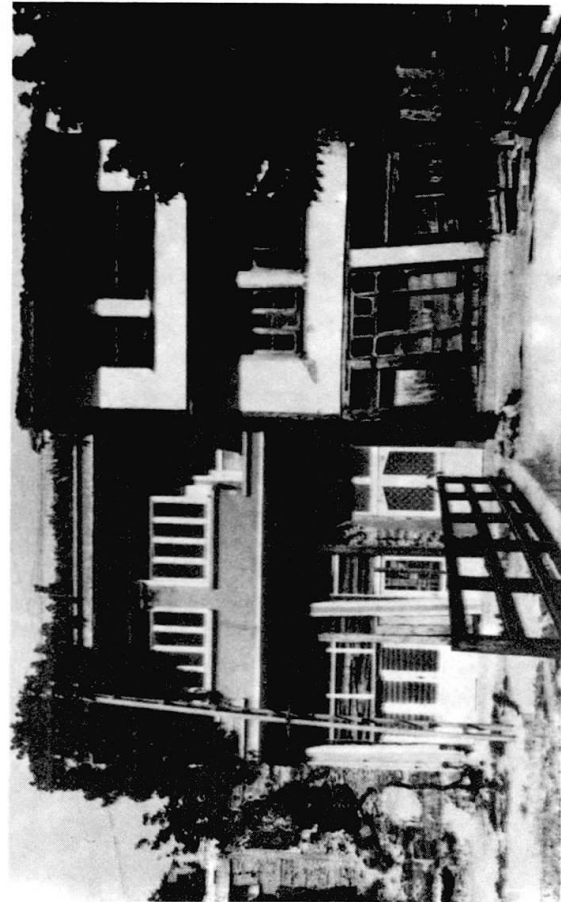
Sidesway Caused by Inadequate Cross Bracing
